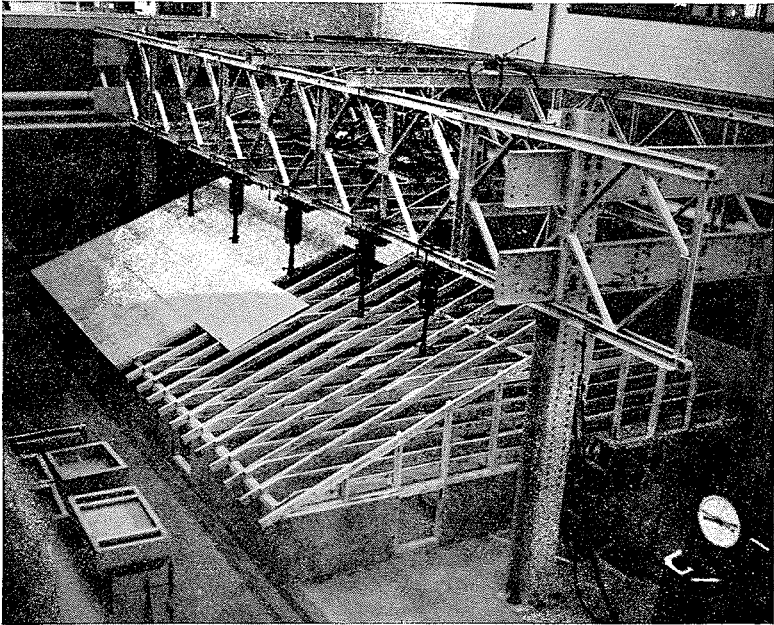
Plywood-Sheathed Roof Under Construction Showing Details of Framing and Sheathing.
